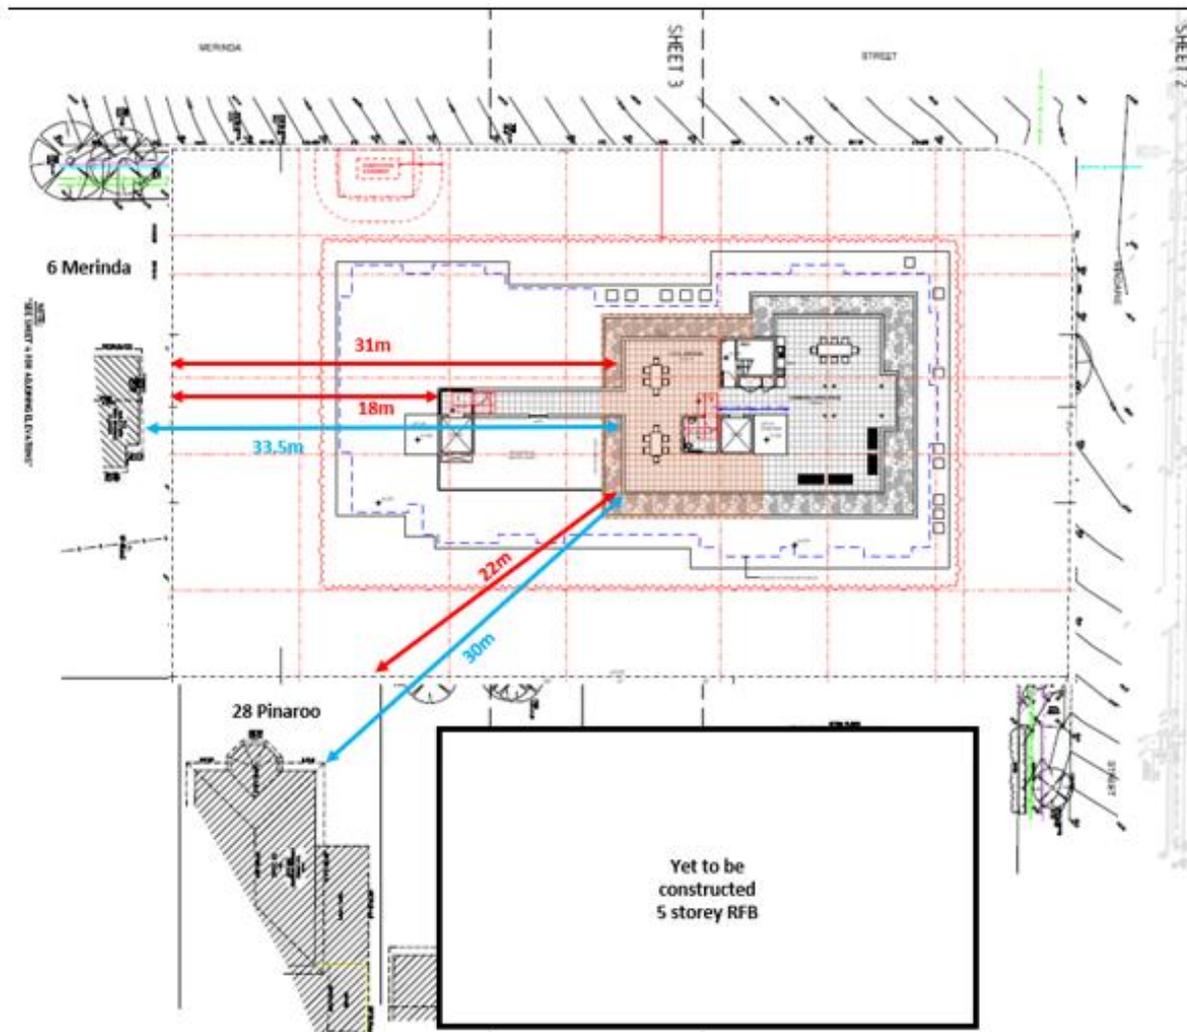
Distance from rooftop terrace to nearest single dwellings.
